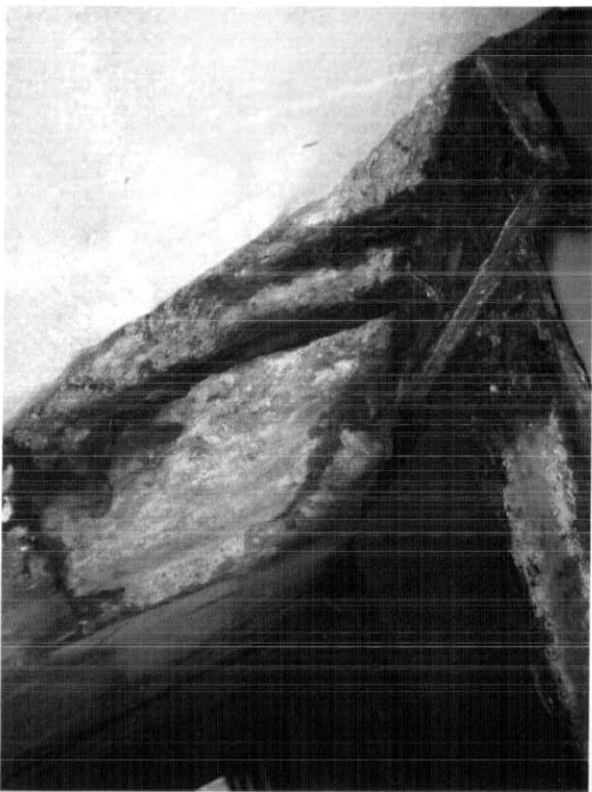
UNDERSIDE OF FLANGE OF BEAM # 8 AT ABUTMENT # 2.
